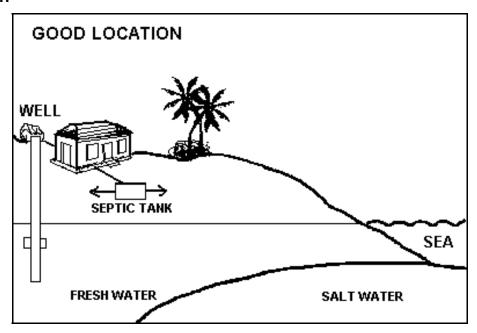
GOOD PLACEMENT. If there is water underground, shallow septic tanks will not pollutewater underground, deep septic tanks will
